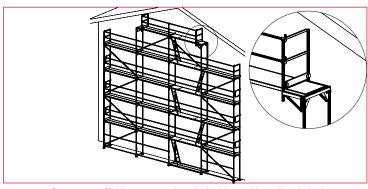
Scaffolding arranged on the building gable wall with the bay 3,07 m reduced to he bay 2,57 with the E285550 console
